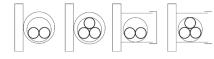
B2 Cables in conduit and cable trunk systems
